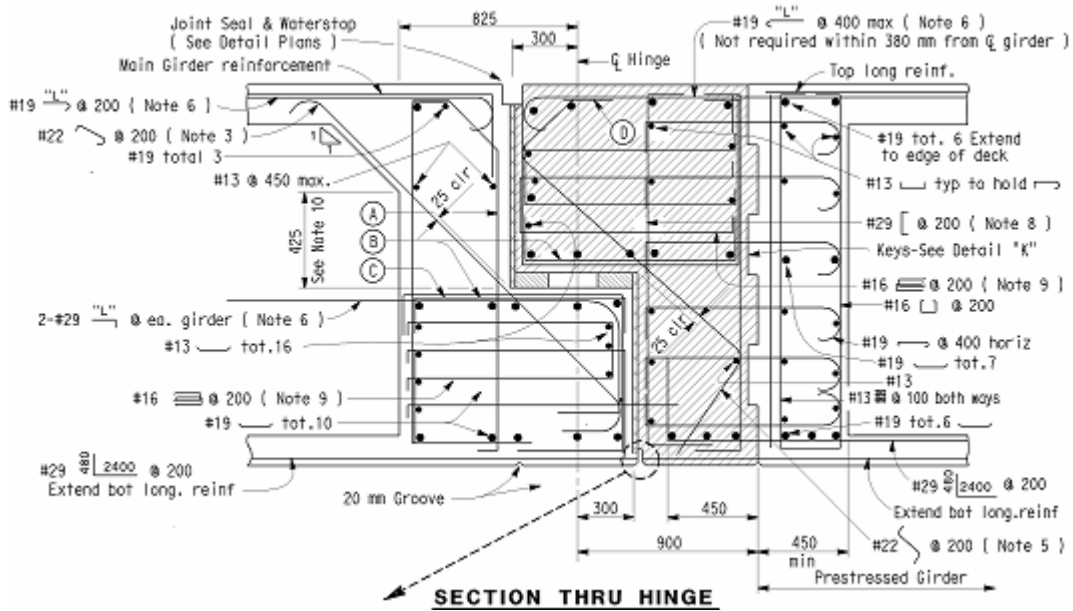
Reinforcement congestion of in-span hinge of prestressed box-girder bridge.
